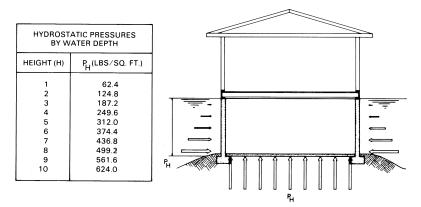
, Hydrostatic pressures on a dry-floodproofed building
